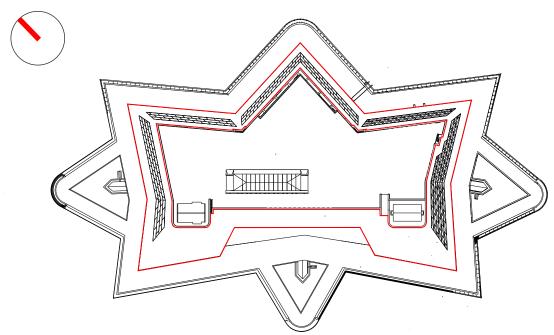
Plan diagram of Fort George showing extent of Green Roof Pocket surface
